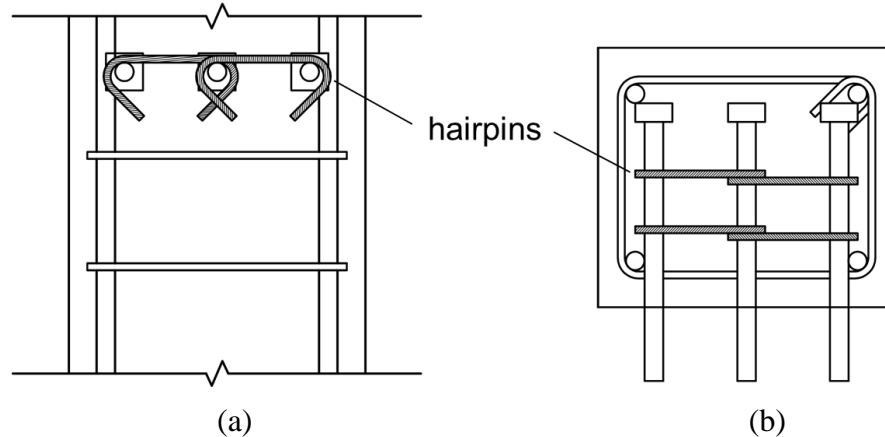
Specimen with hairpin reinforcement (a) front view, (b) top view
